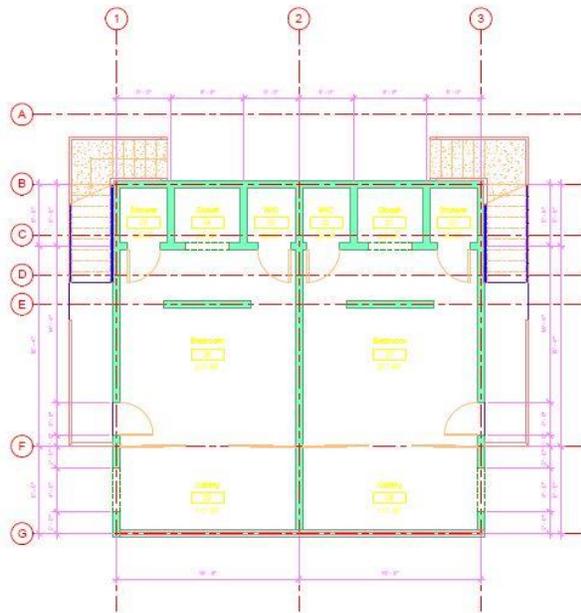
Ground Floor Plan View (Suites & Penthouse Duplex)
